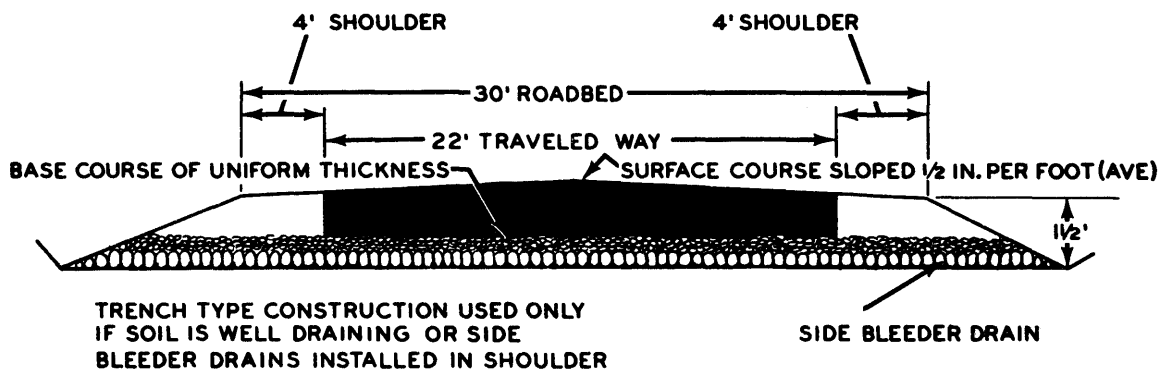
Cross-section design for two-way road using double-course, trench-type construction.
